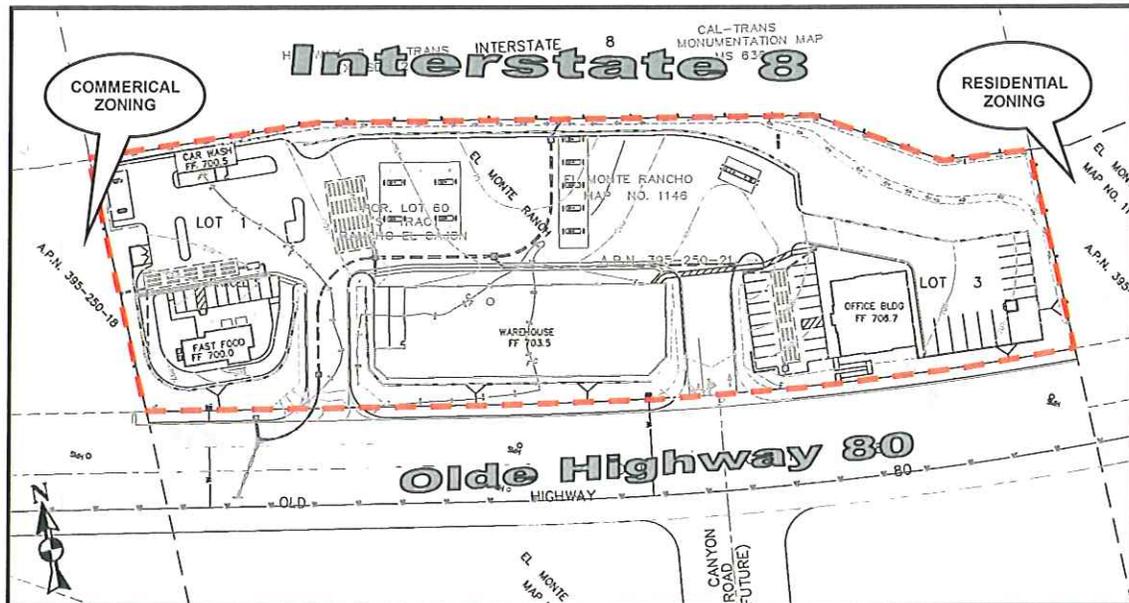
Proposed TPM 20974 Site Plan (Hale Engineering, 5/06)
